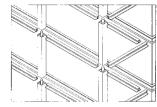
Steel frame with prefabricated floor elements and concrete topping Burkard, Meyer Architekten: Swisscom headquarters, Winterthur (CH), 1999
